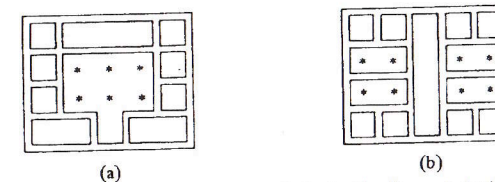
Two plans used by Palladio in his villa projects that fail to satisfy proviso 3. Plan (a) is used in the Villa Cornaro, and plan (b) in the Villa Moncenigo.
